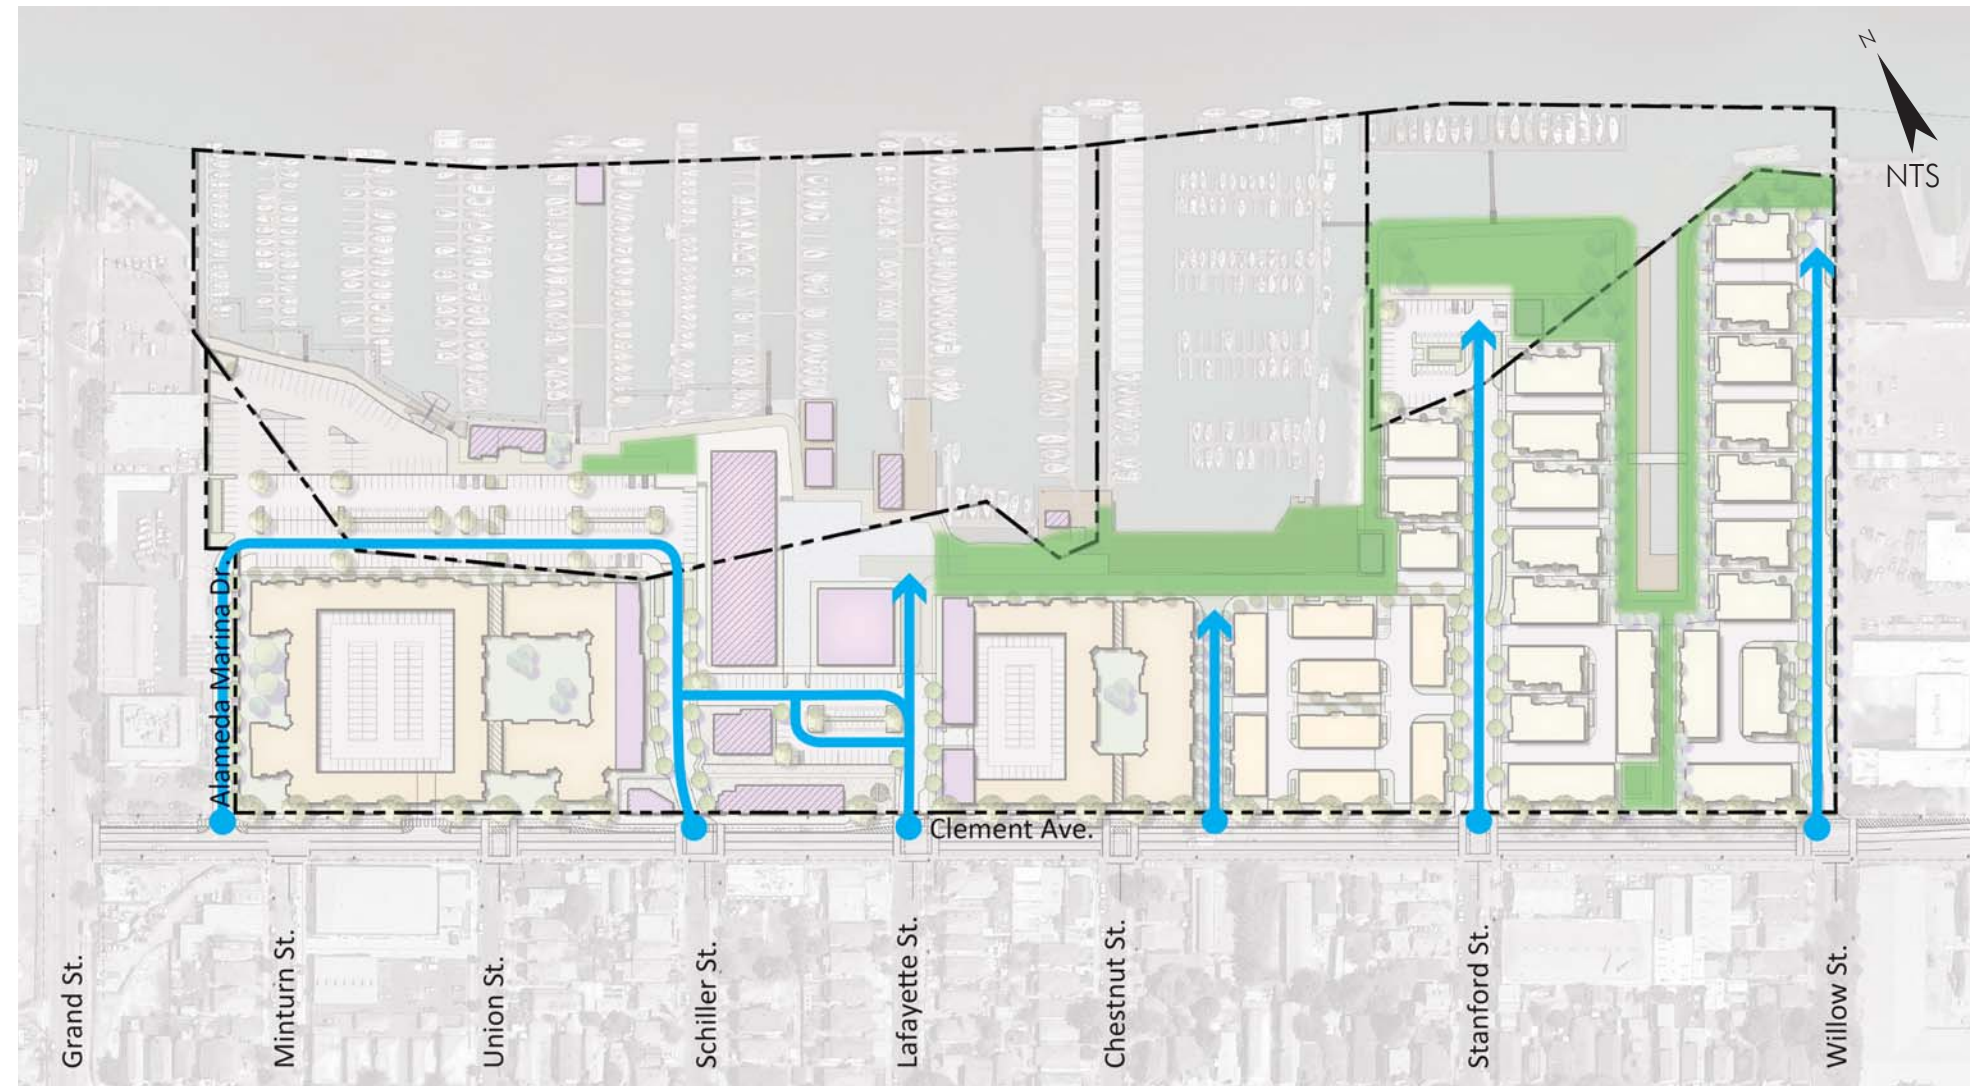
Internal Streets and Open Space Facility Diagram
